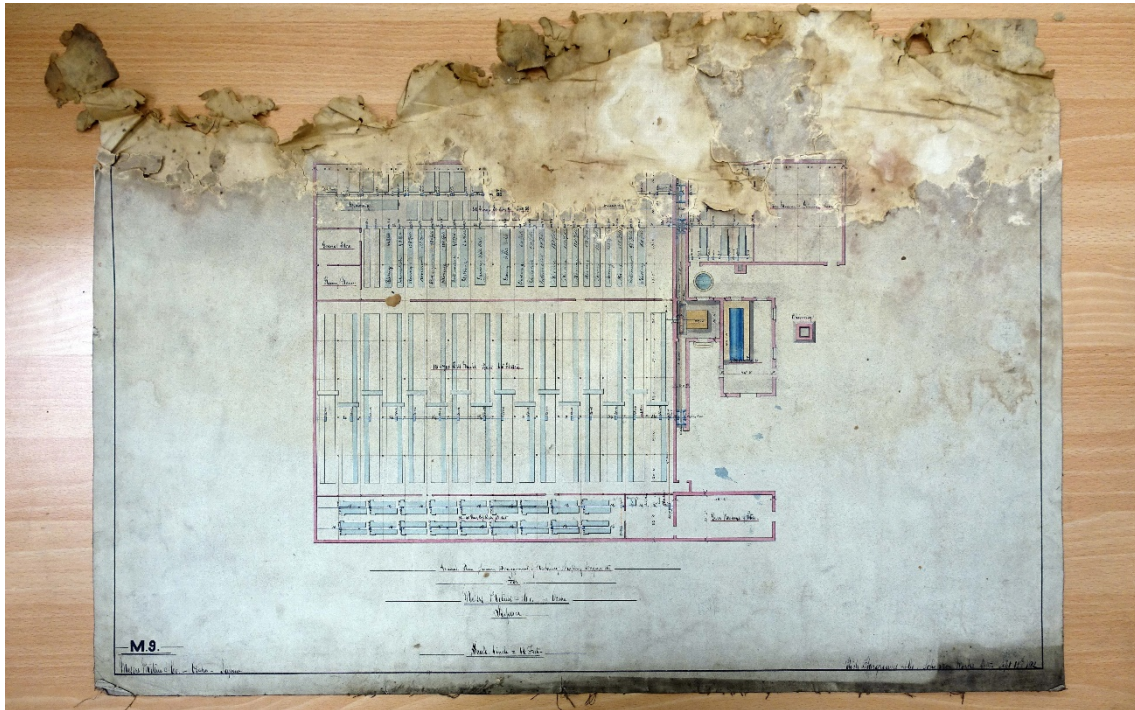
Machinery layout plan, Mill No. 1 at Osaka Bōseki [1882/28]
